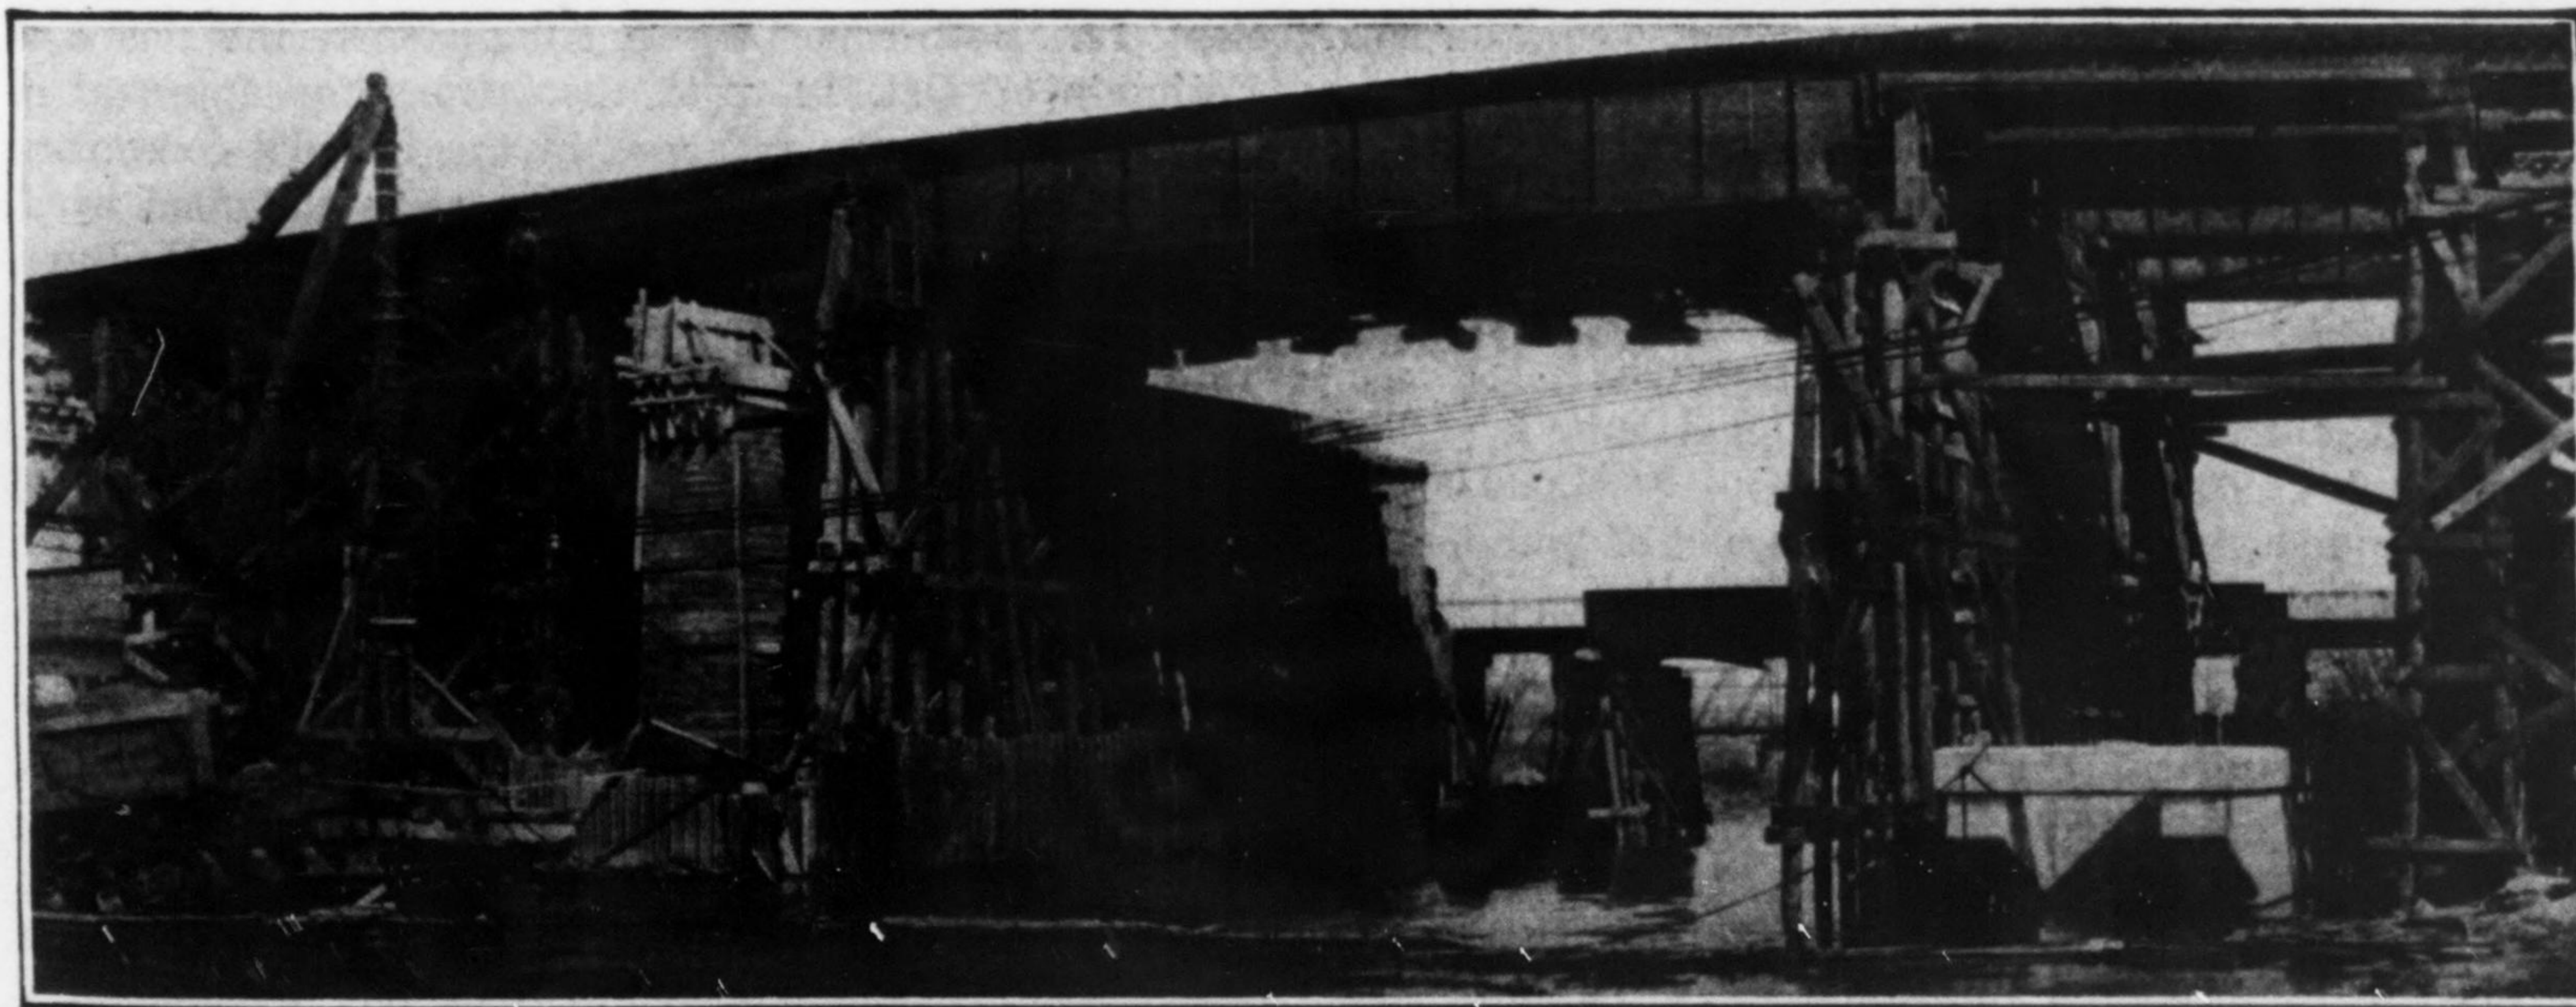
TEMPORARY BRIDGE DURING SUBSTRUCTURE WORK
